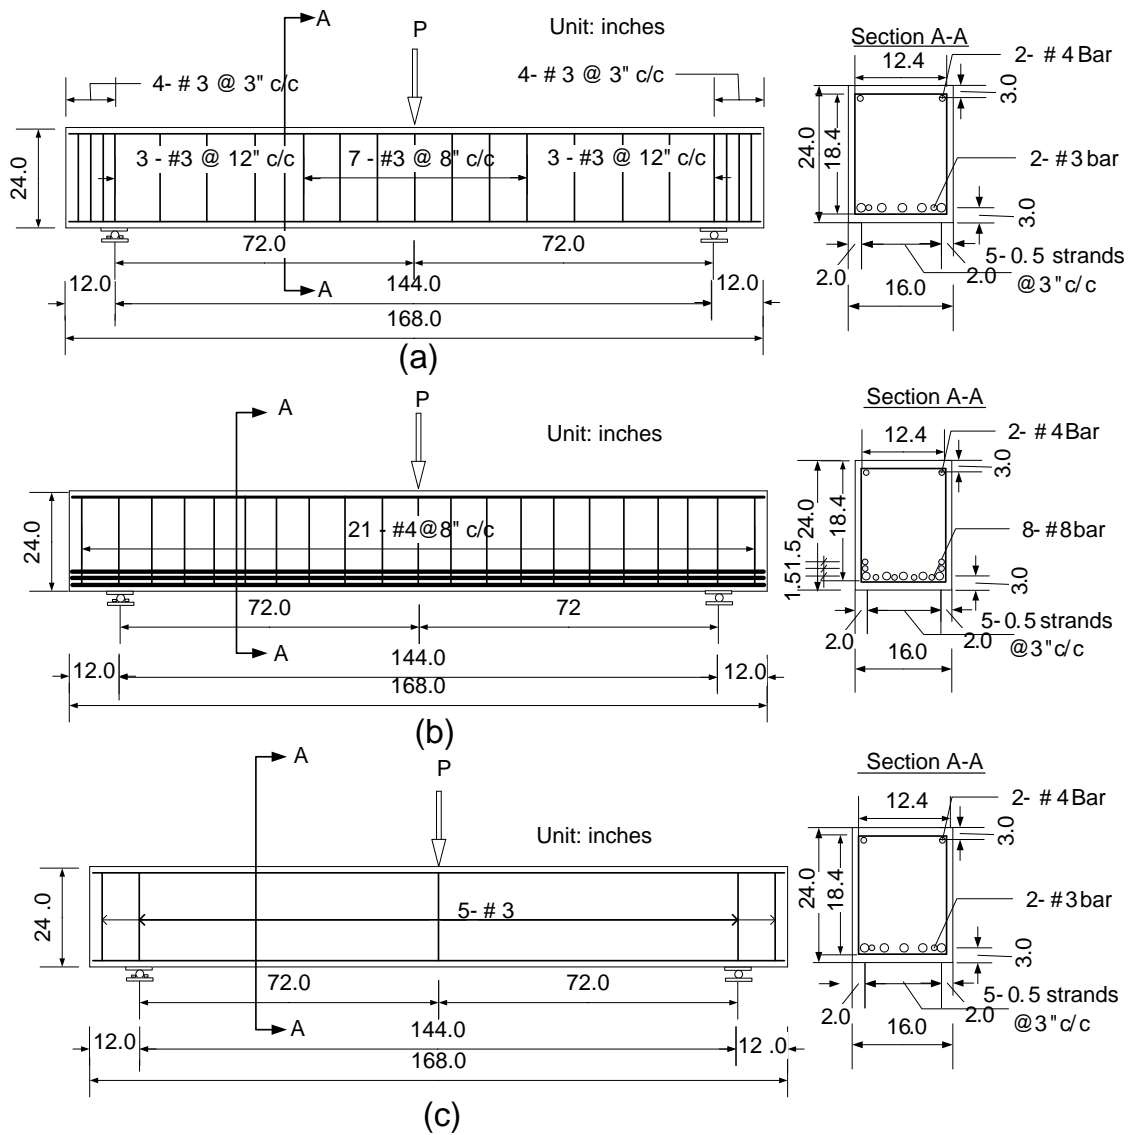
Dimensions of Beam Specimens Used in the Second Phase:
